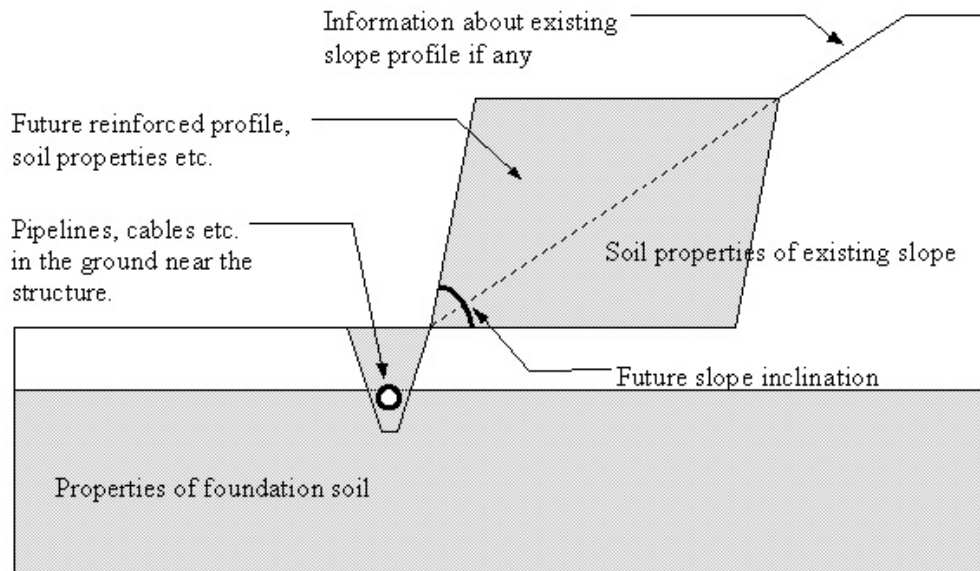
Typical geometry for a reinforced fill including foundation properties
